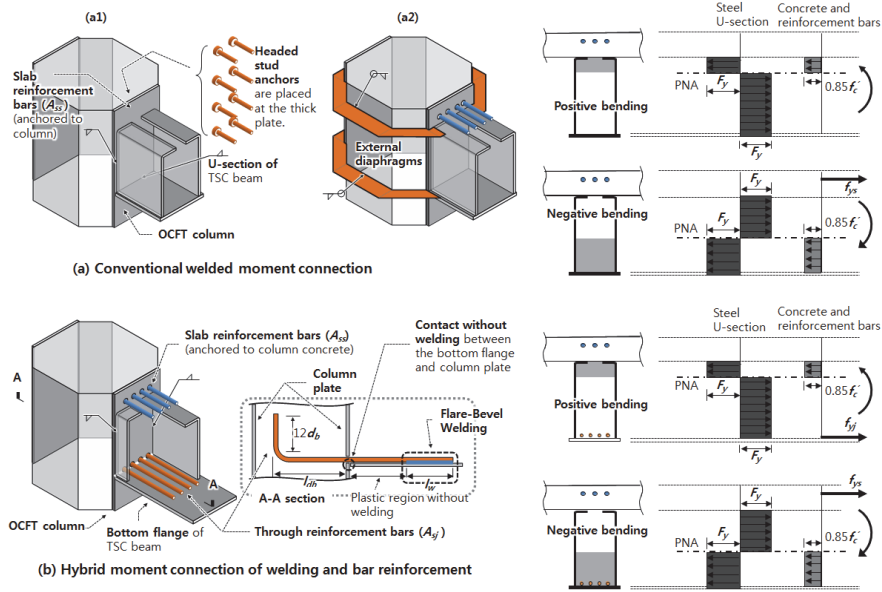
Exterior TSC beam-to-OCFT column connection details for moment connection
